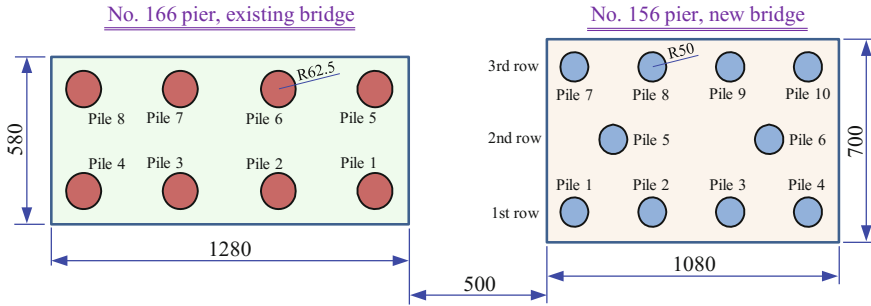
Layout of platforms and piles of new bridge and existing bridge (Unit: cm)
